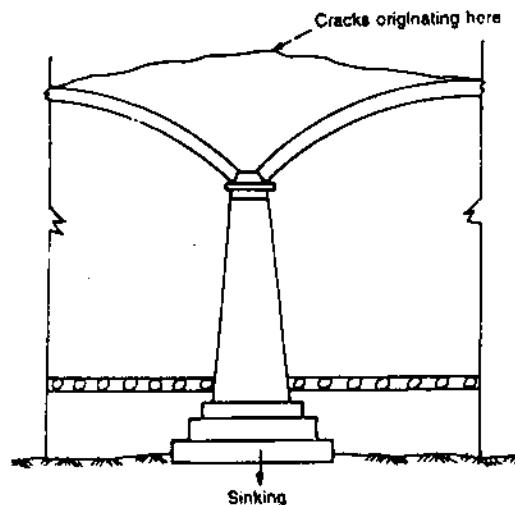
Cracks in spandrel wall due to sinking of pier
